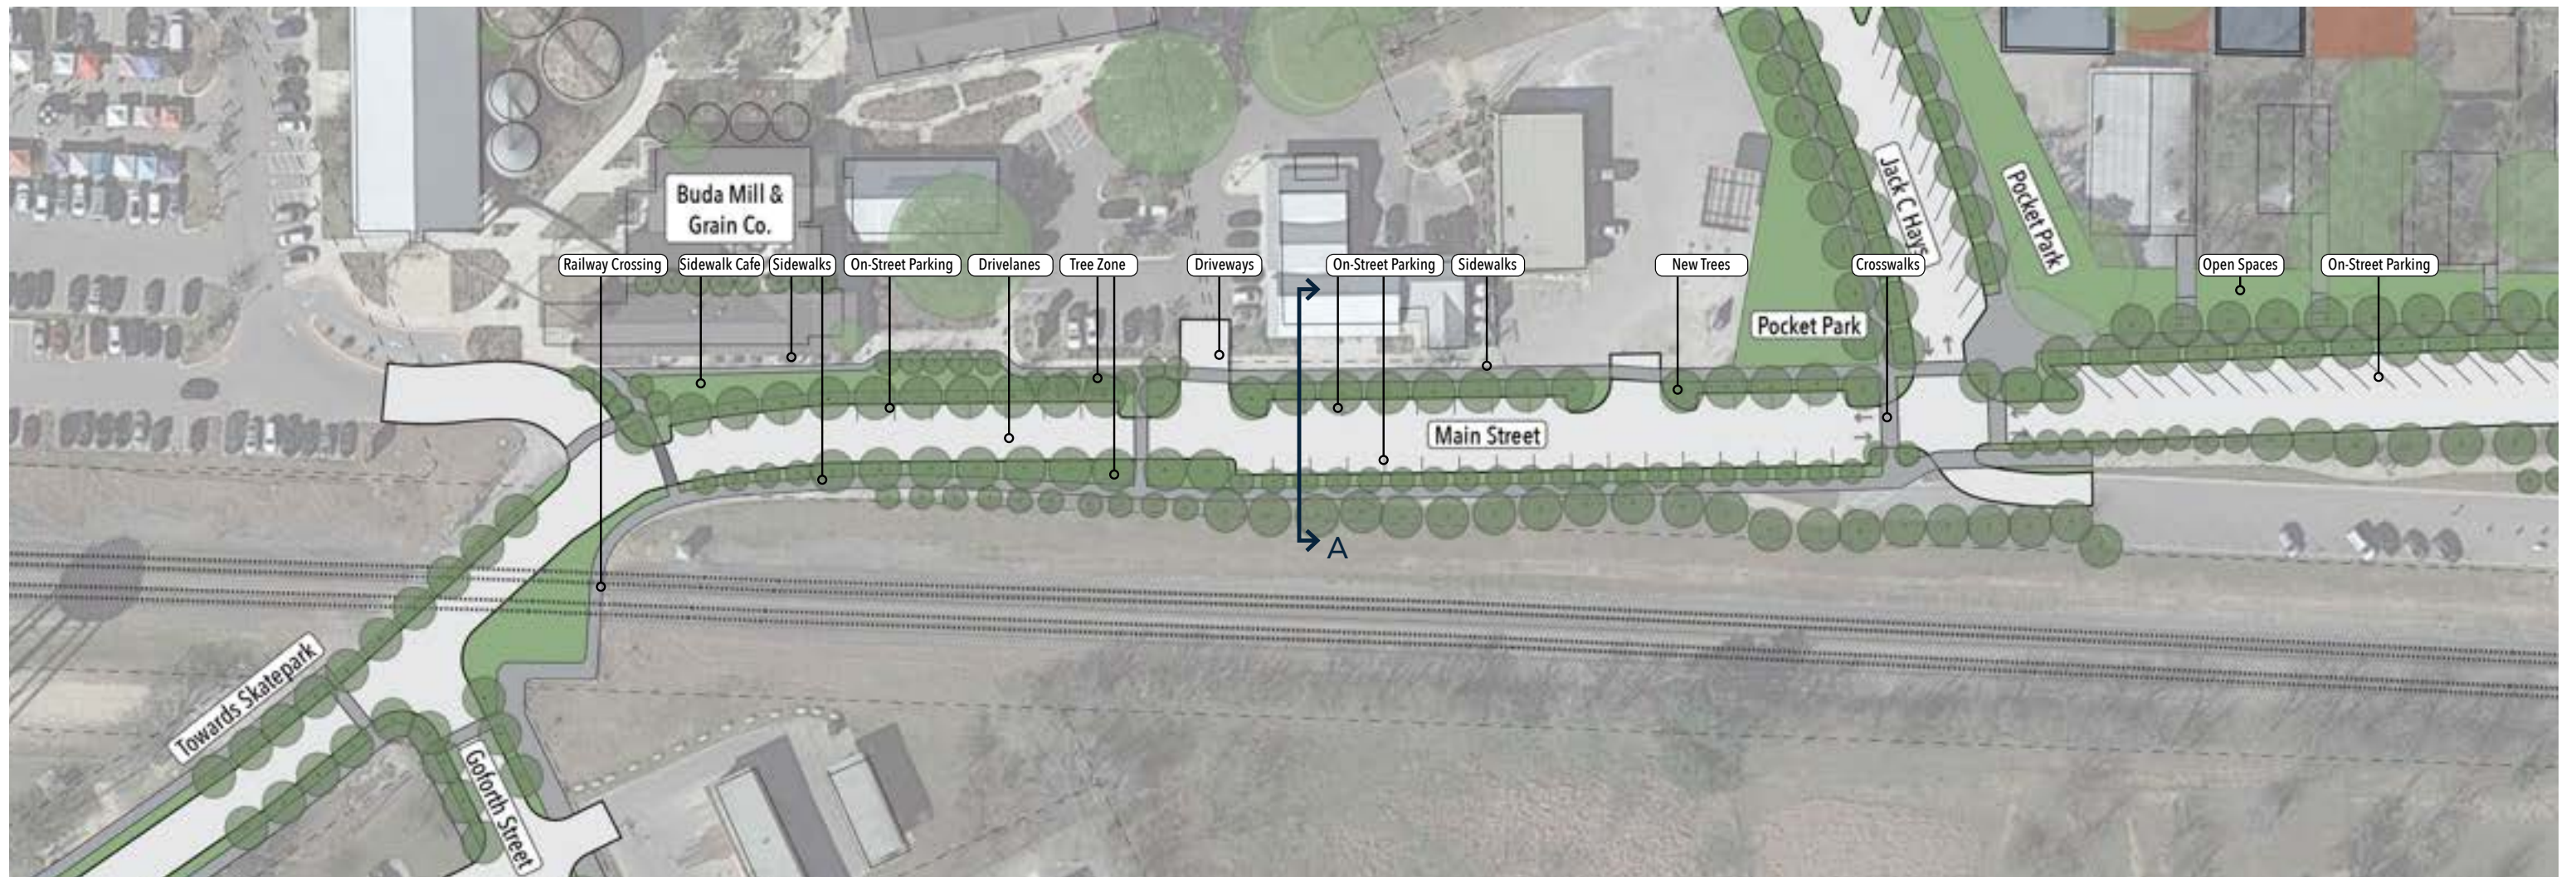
South Main Street Improvements: Overall Design Concept Plan
